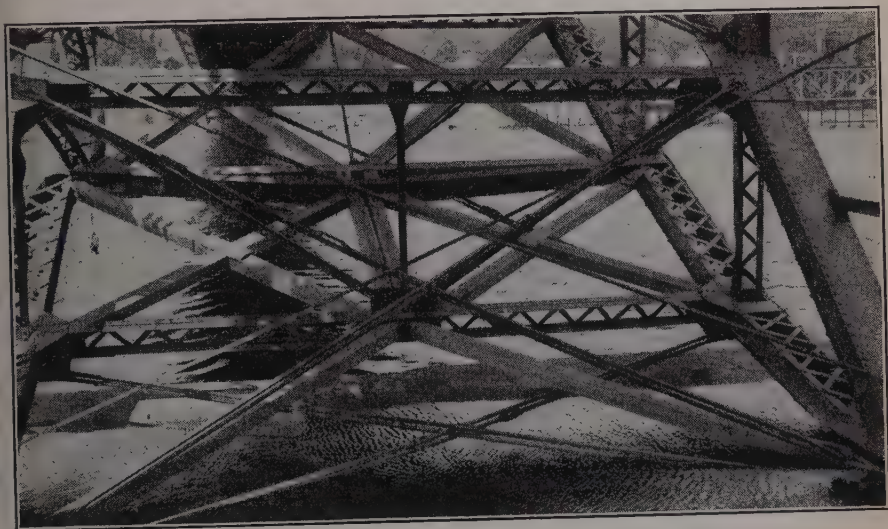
EMERGENCY BRACING IN THE PLANE OF THE BOTTOM CHORD; VIEW FACING ALONG THE BRIDGE TOWARD NEW HAMPSHIRE
